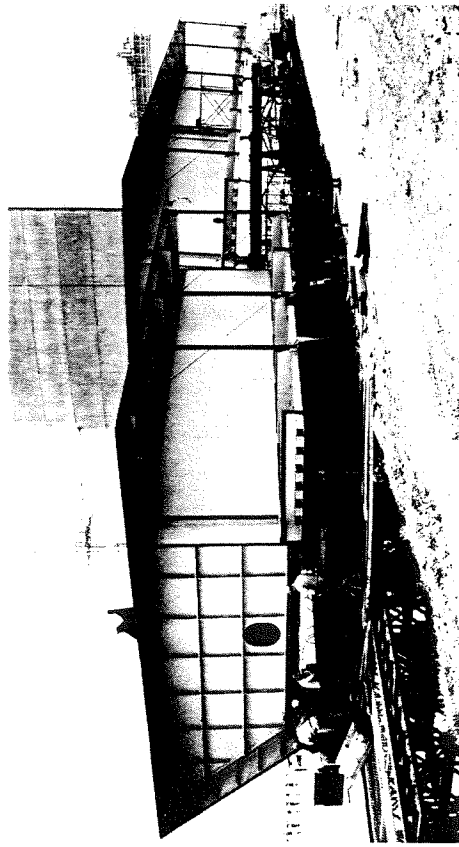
Box-girder bridge under construction, Avonmouth, UK.
